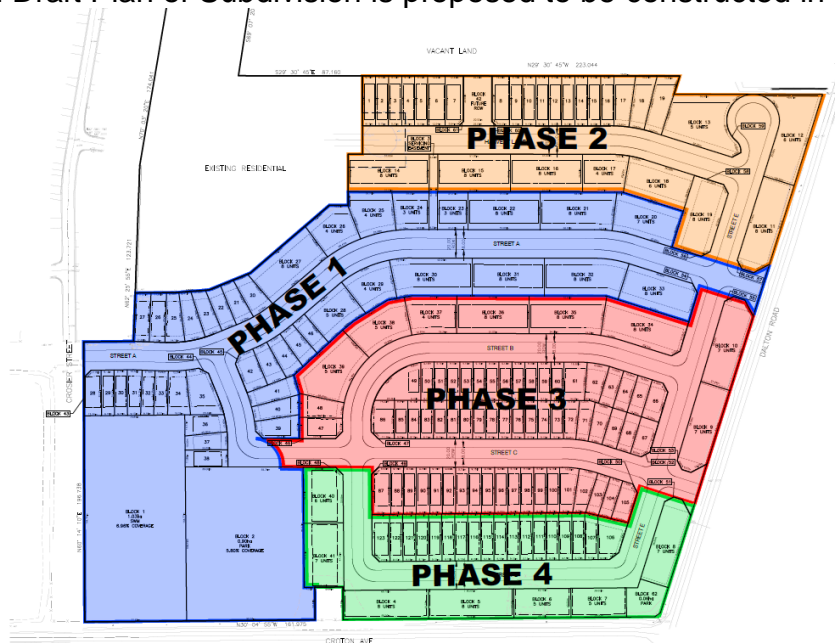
Proposed phasing plan for the Draft Plan of Subdivision.
